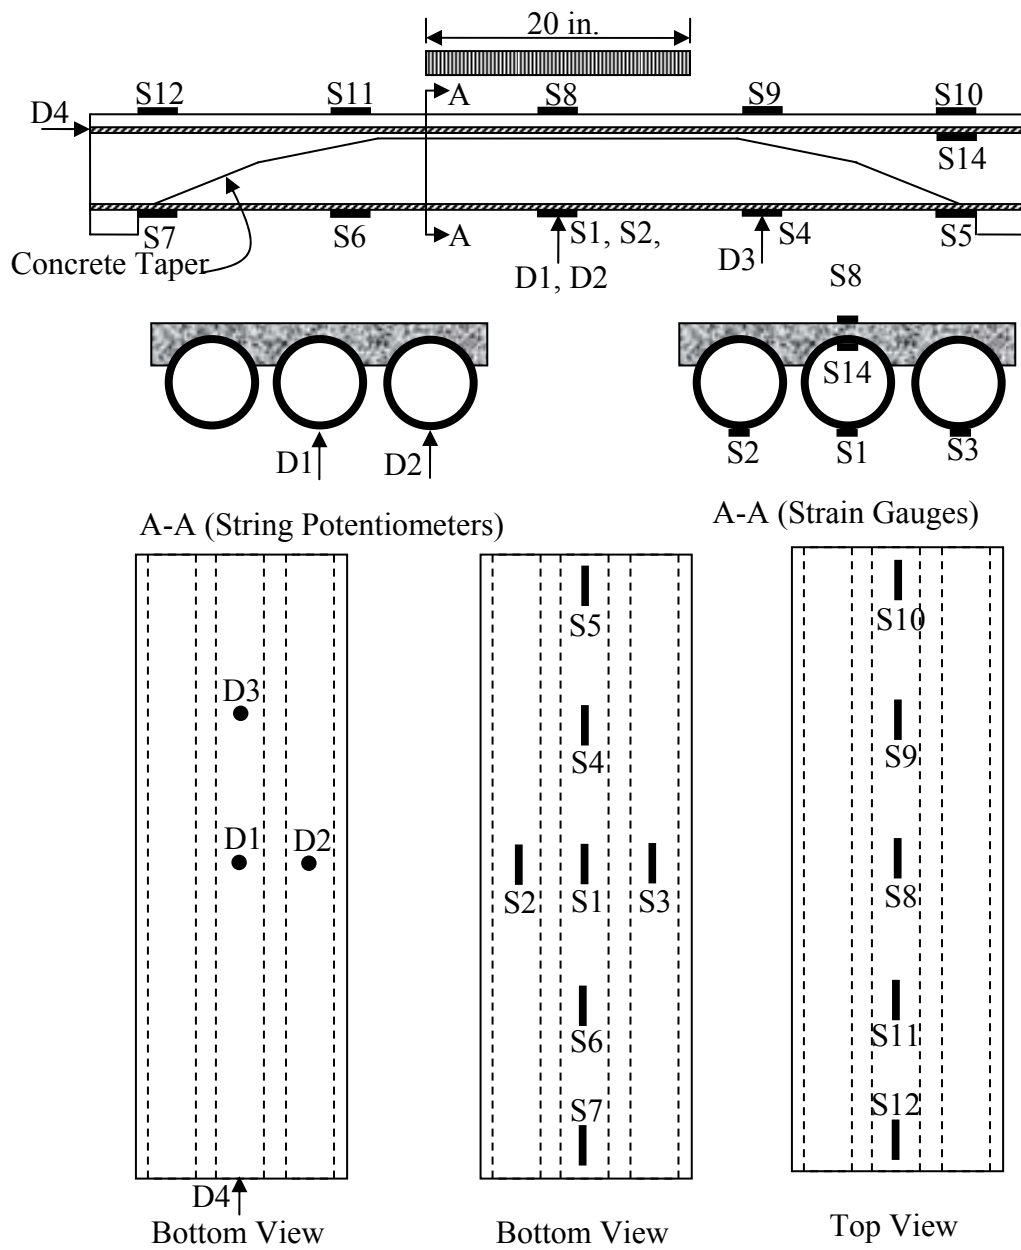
Instrumentation Plan for the Tapered Section UHPC-FRP Deck Specimen
